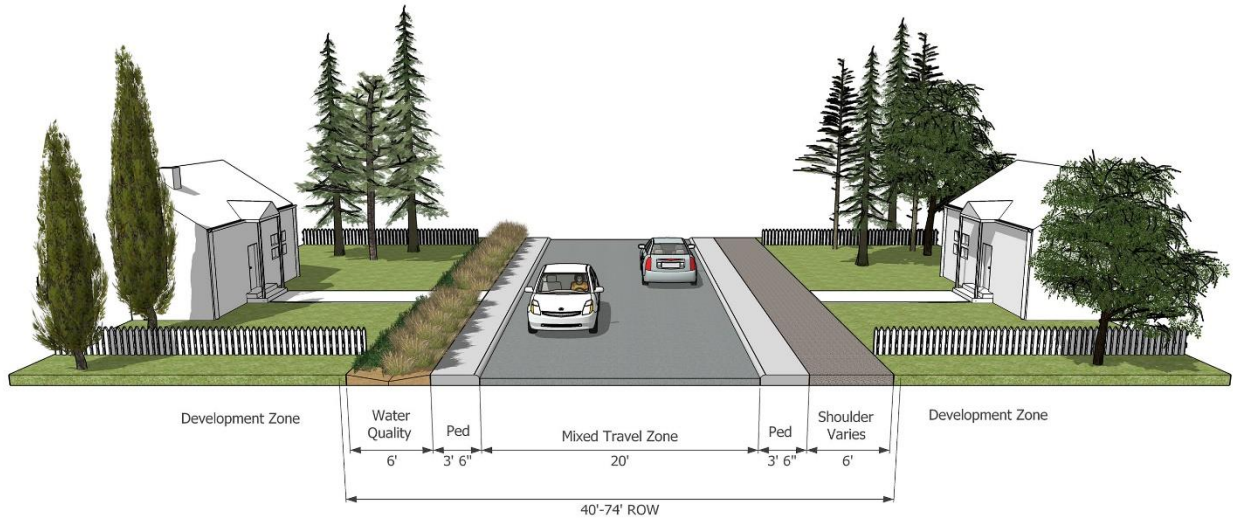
Local/Neighborhood Street with Sidewalks and On-Street Parking
